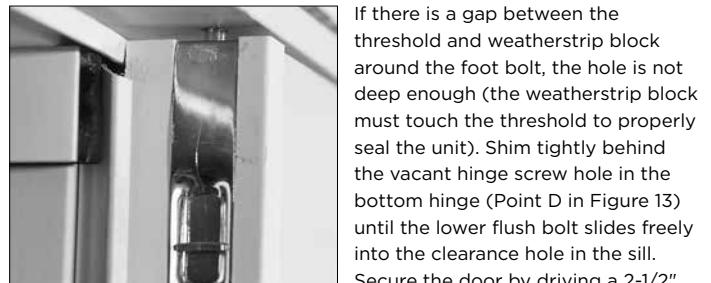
Correct sagging until the flush bolt slides freely into the pre-drilled hole (not typical of most units) in the head/threshold.
